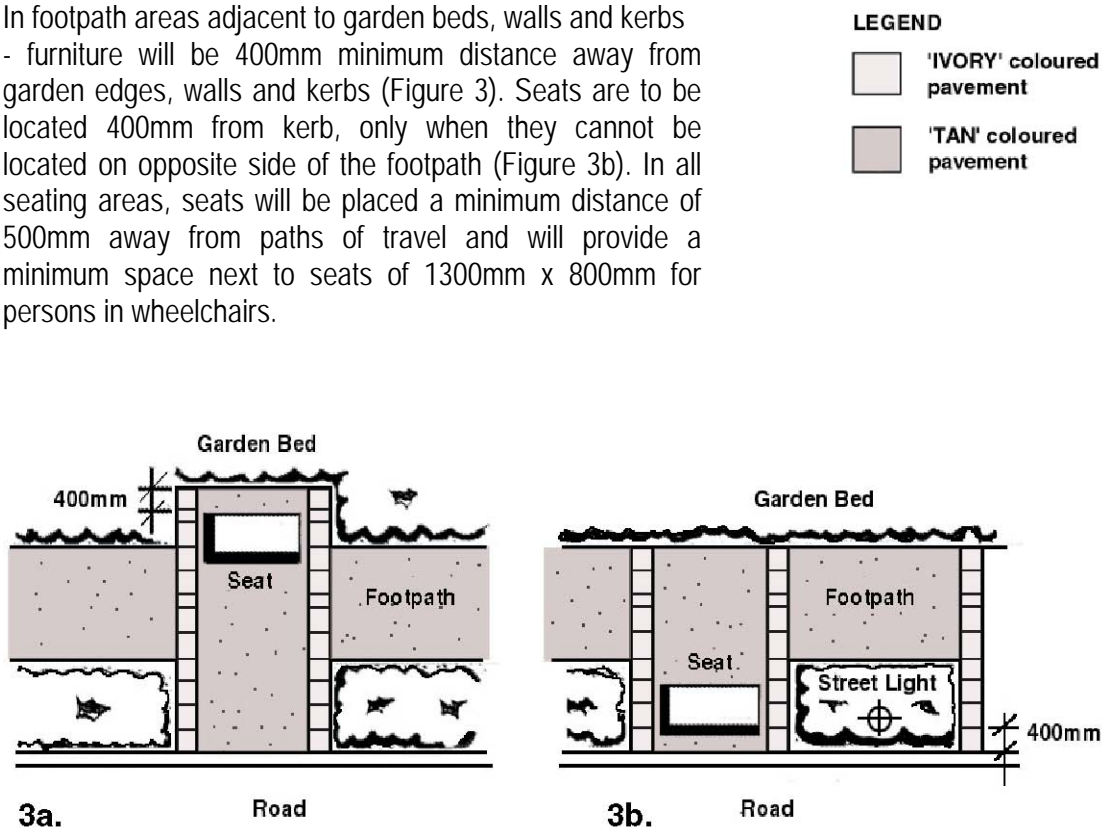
General location of furniture adjacent to garden beds, kerbs, and walls.
